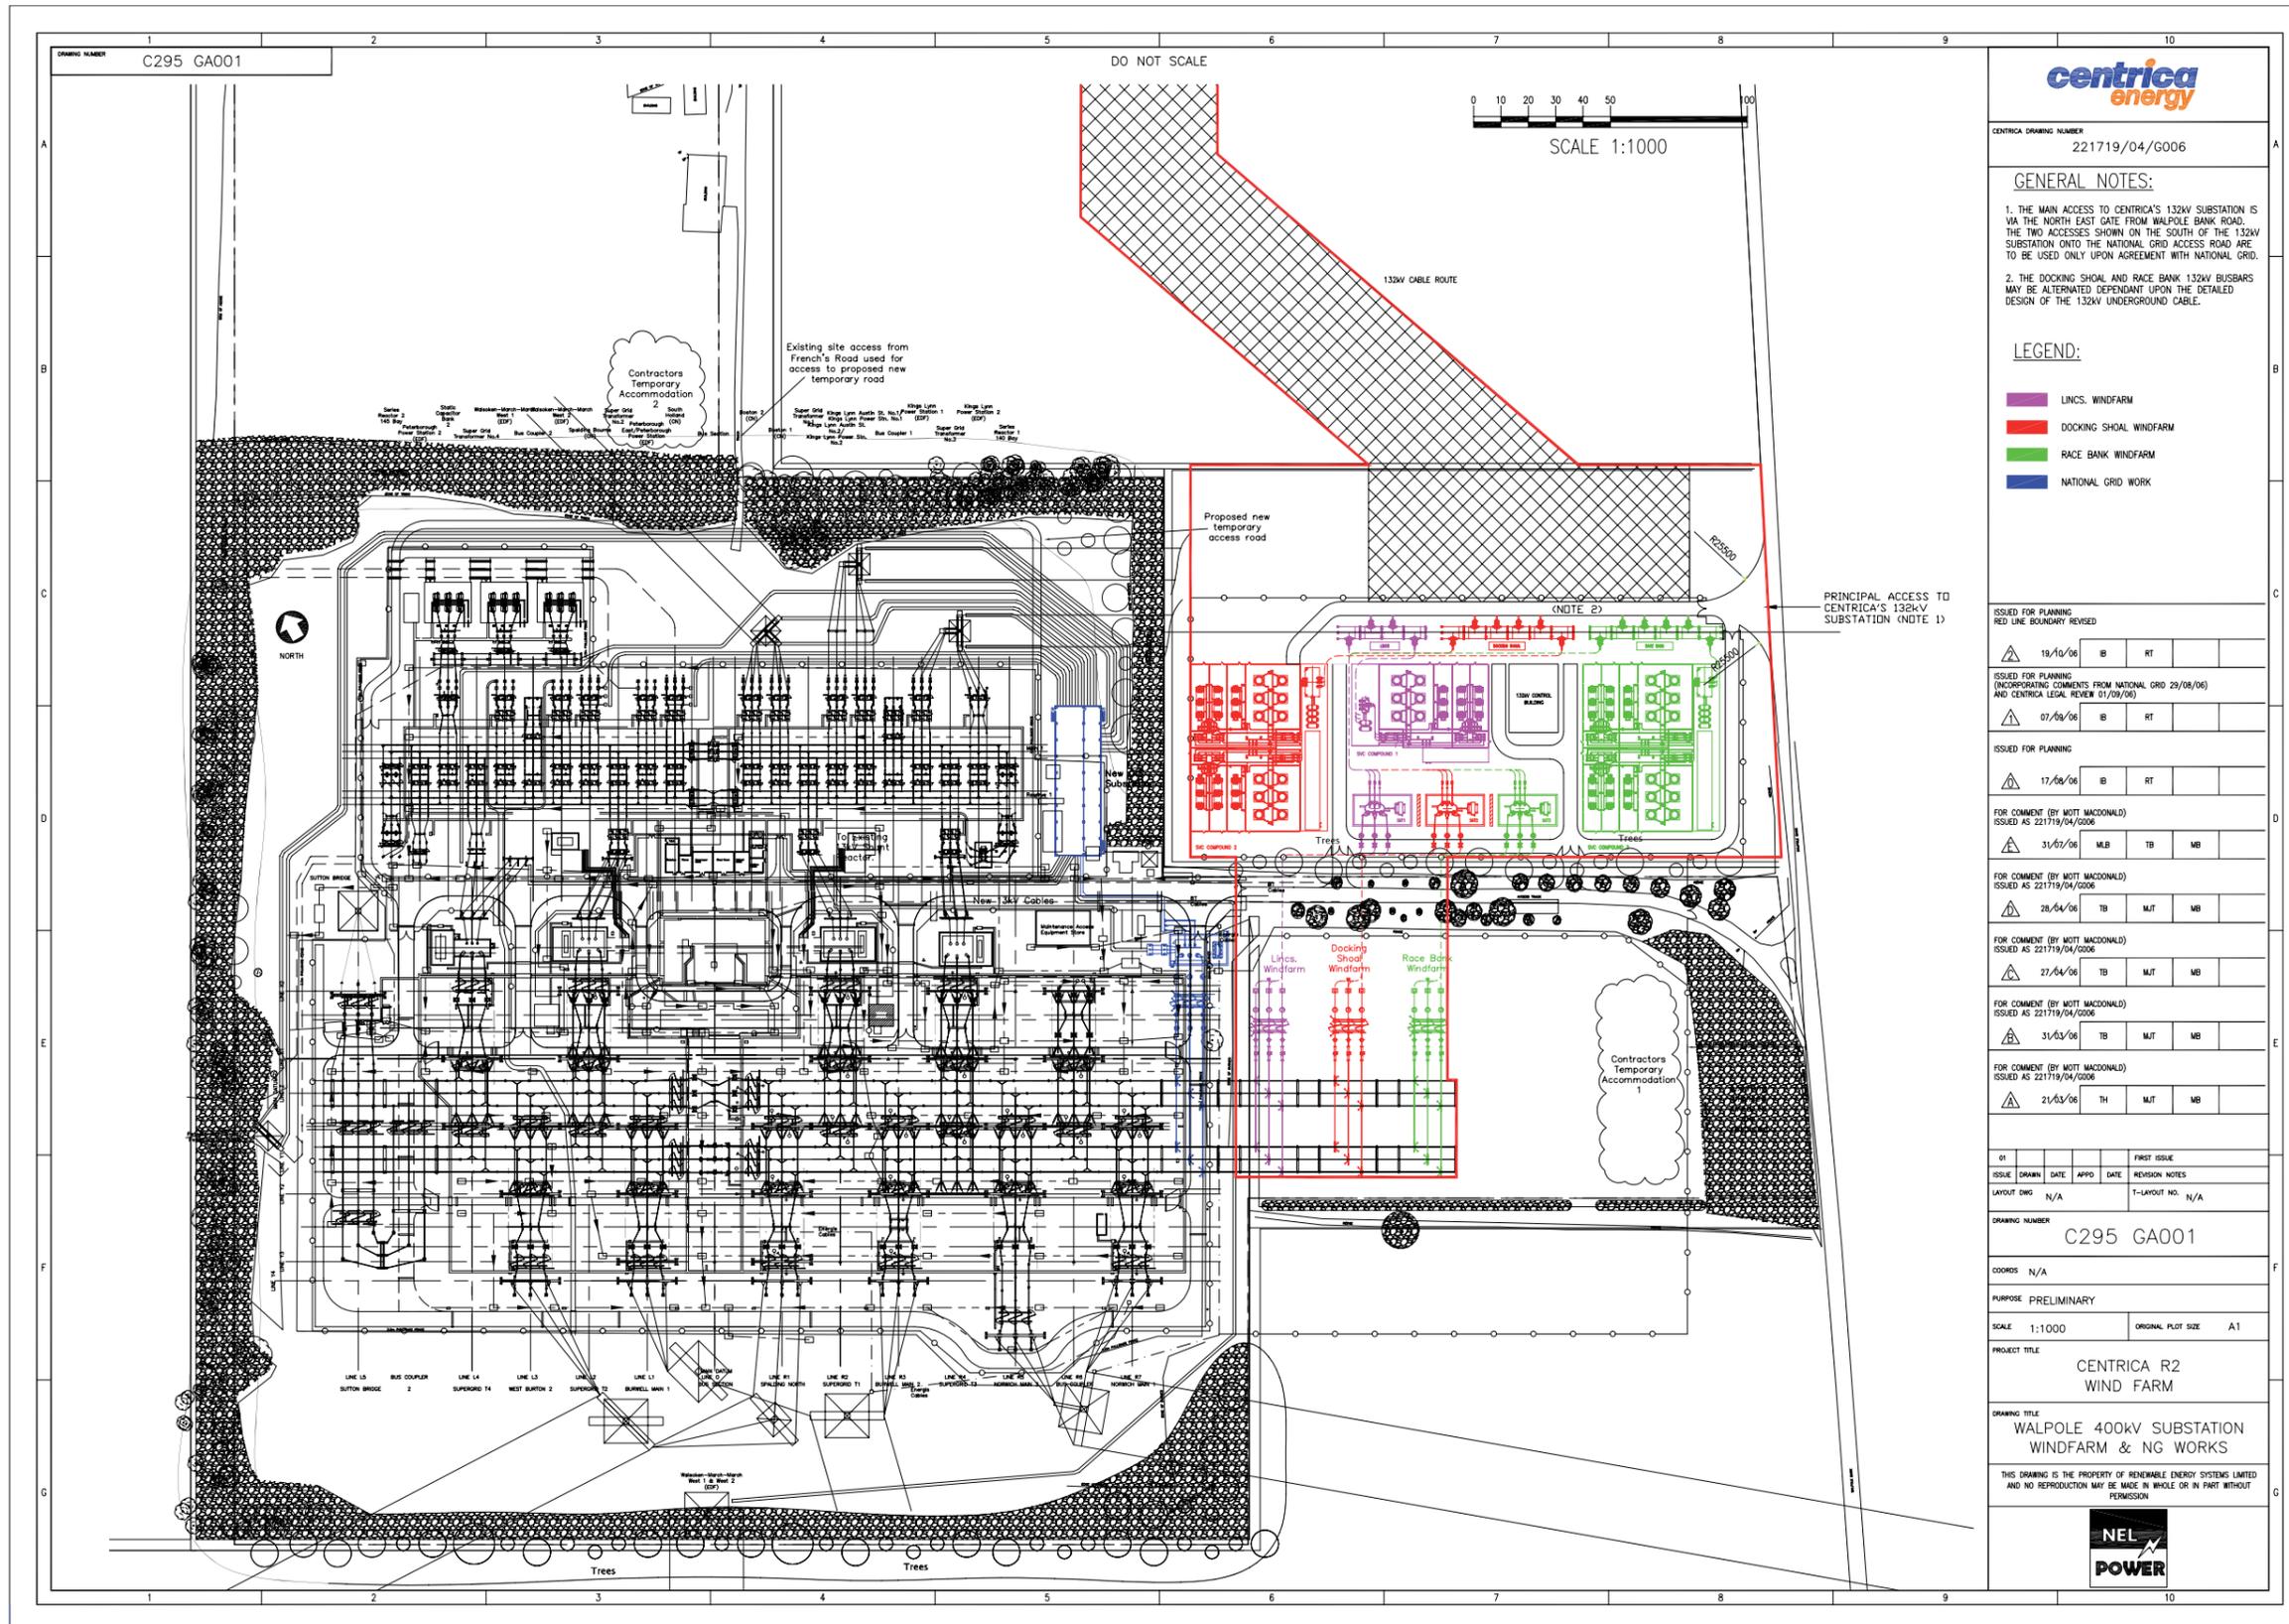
| Layout of the substations for Lincs, Docking Shoal and Race Bank in relation to the existing substation at Walpole Marsh
